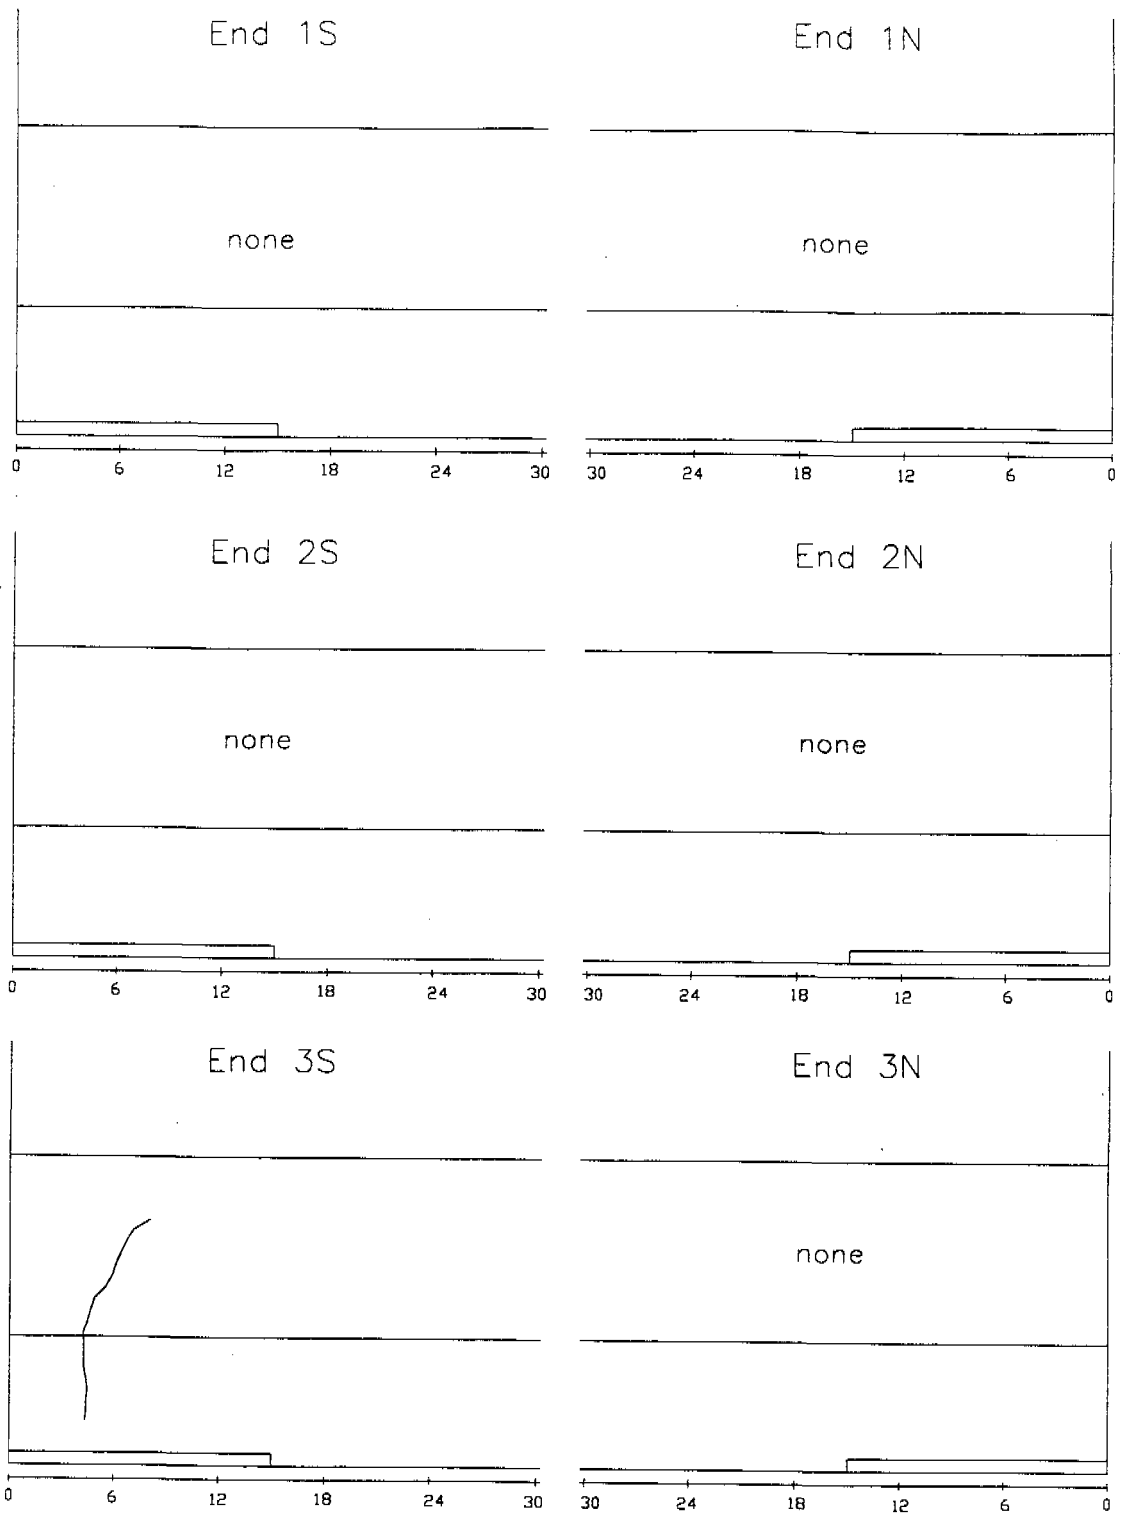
Survey Form for 45 in. Girders, 8-16-95
